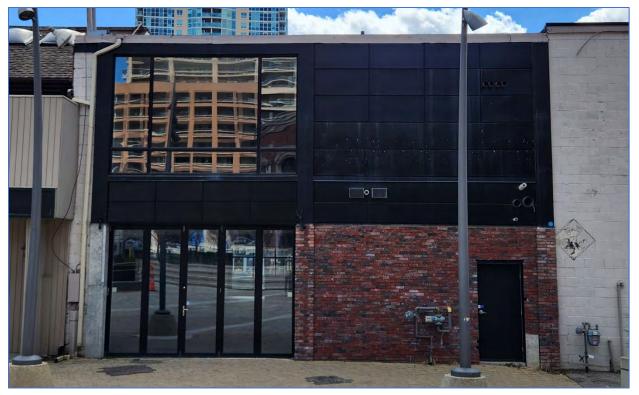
View southwest showing the building at 36-38 Main Street North's northeast (rear) elevation
